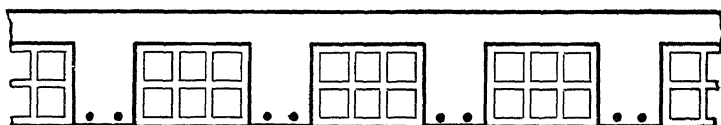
Typical Reinforced Concrete Beam-and-Tile Construction.
